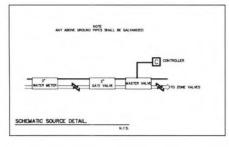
EXHIBIT "B" LANDSCAPE AND/OR SITE PLAN
